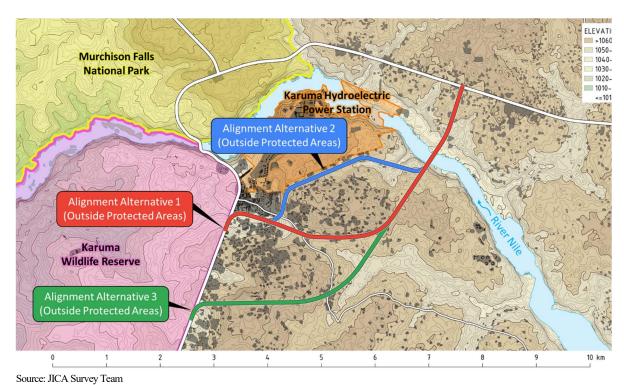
Road Alignment Alternatives (Outside Protected Areas)
